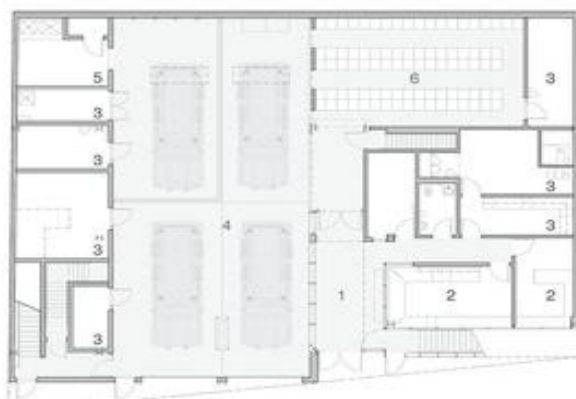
6 Ground floor plan of Greenpoint EMS Station
